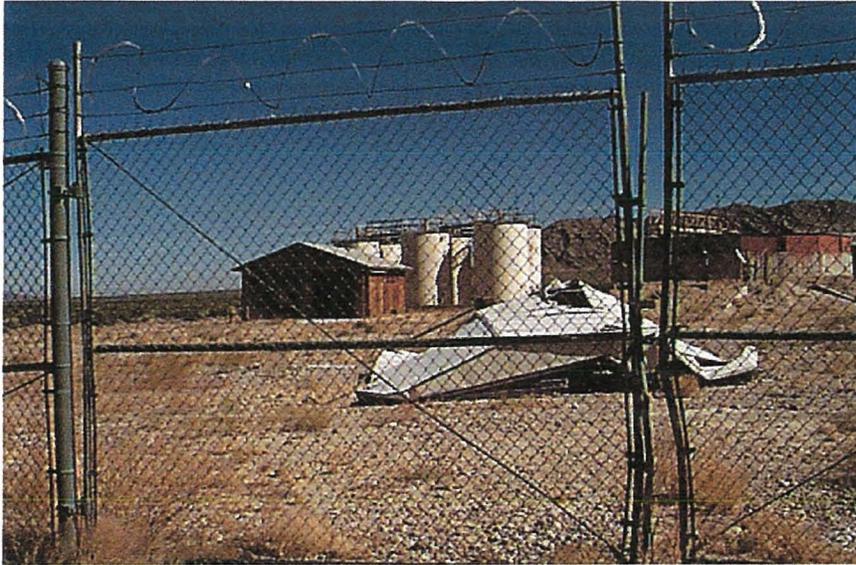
Taken by E. Seum on 7/15/98. Taken looking north at small building on the Advance #5 mill site.
